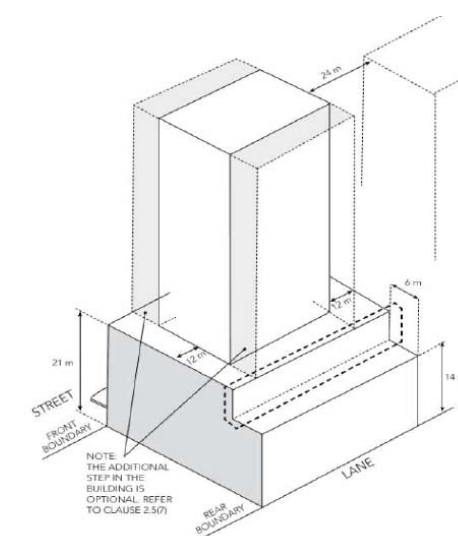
Tower on a Podium/Mid-block - Draft Liverpool Development Control Plan 2008
